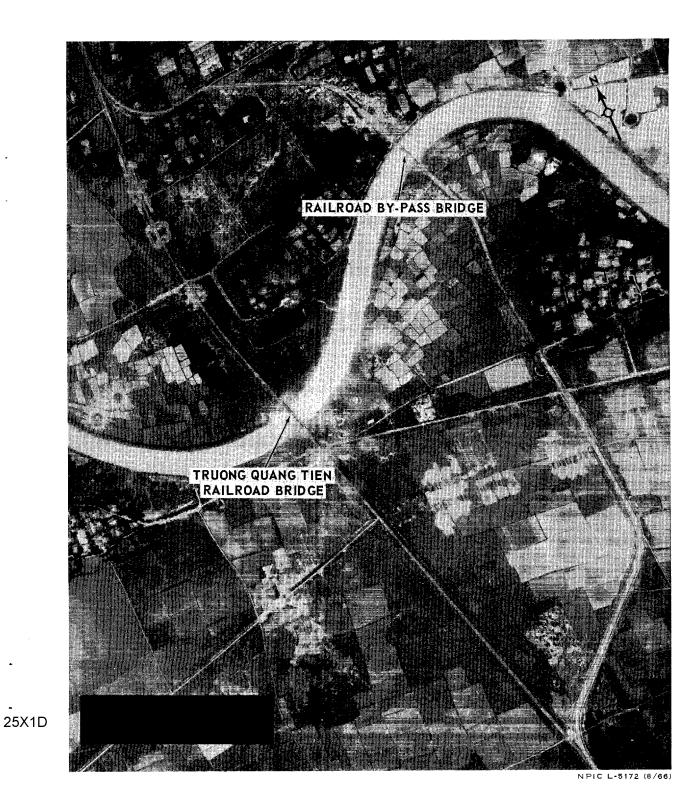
RAILROAD BY-PASS BRIDGE, THANH HOA/VINH RAIL LINE, NORTH VIETNAM
